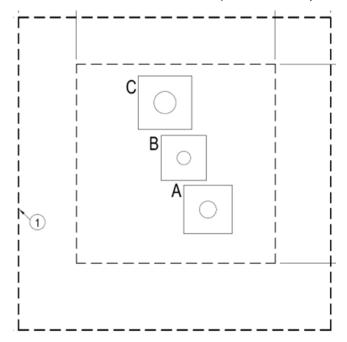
Plastic pipe with PROMASEAL® FC 40 – 65 collars (floor unexposed plan view)
